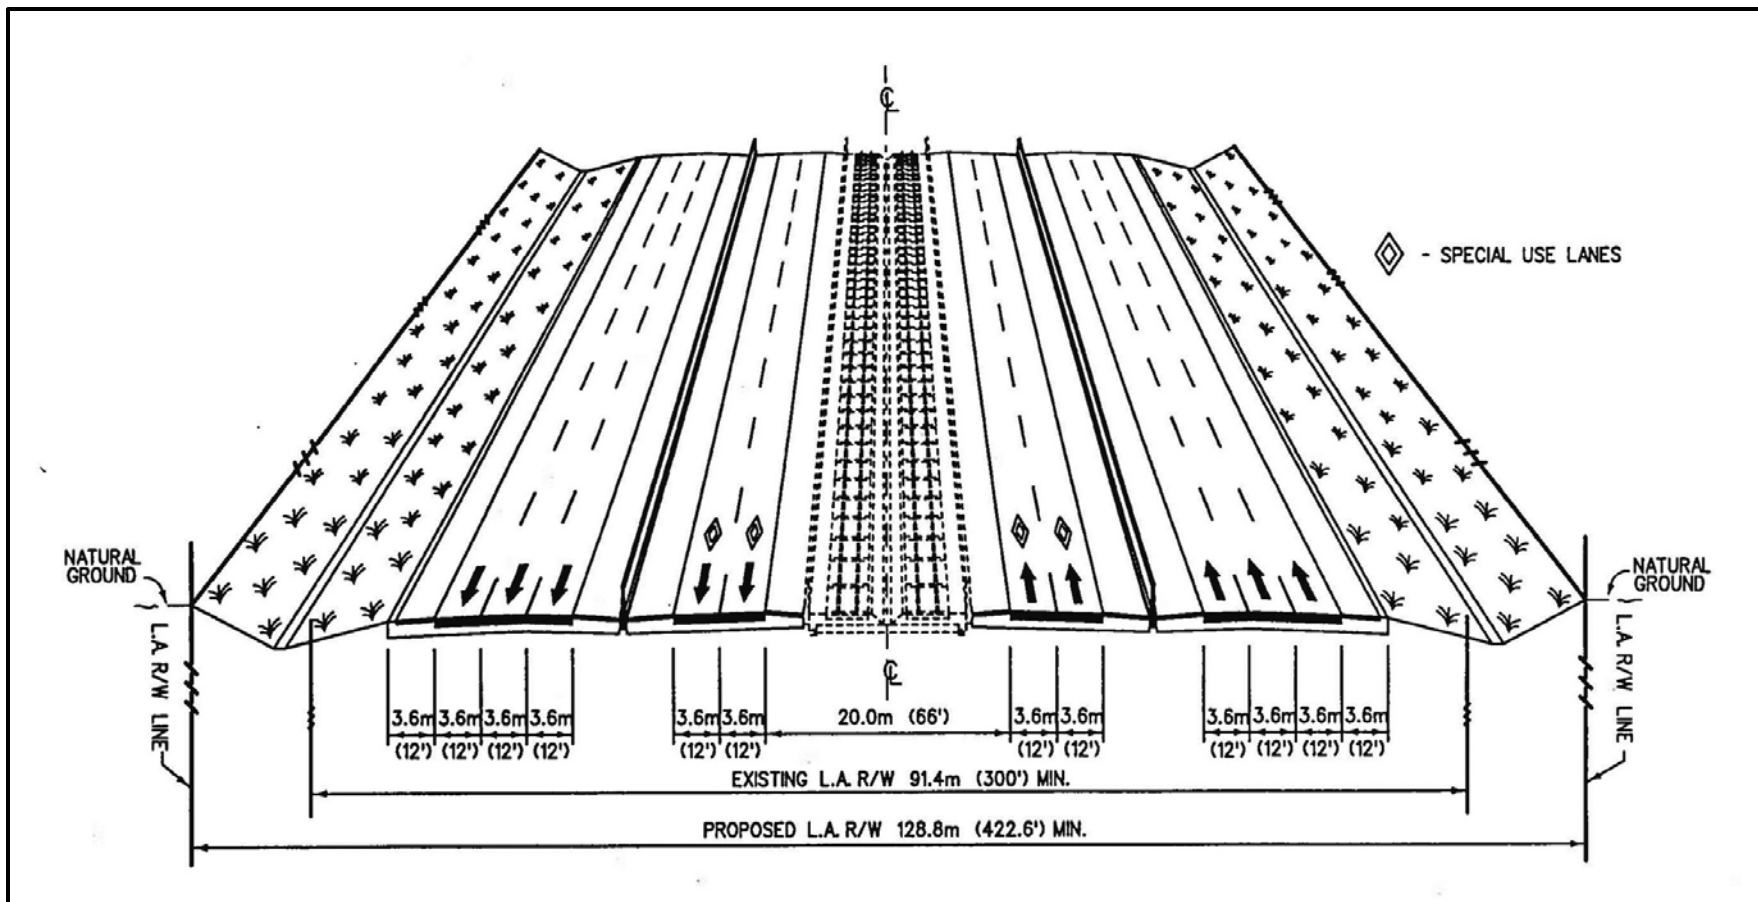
SR 400 (I-4) Previously Recommended Typical Section (1998 EA/FONSI)
